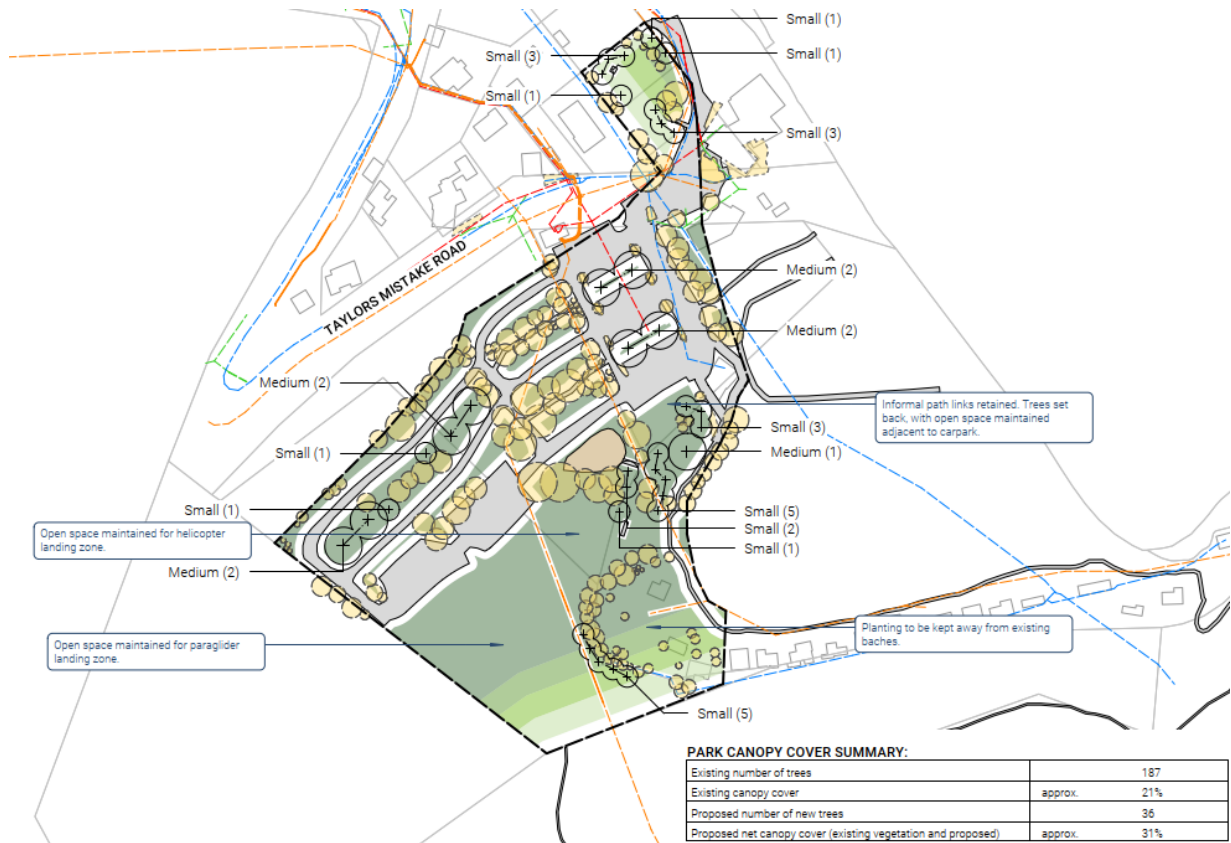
Amended Taylors Mistake Beach Tree Planting Plan
